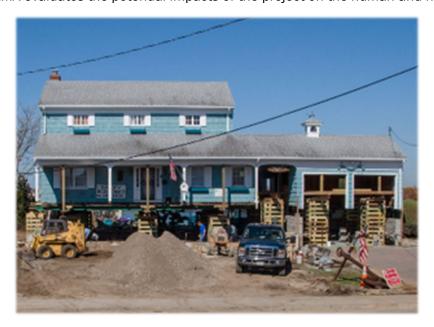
Photo shows a house elevated on temporary supports while crews work on a new foundation.
